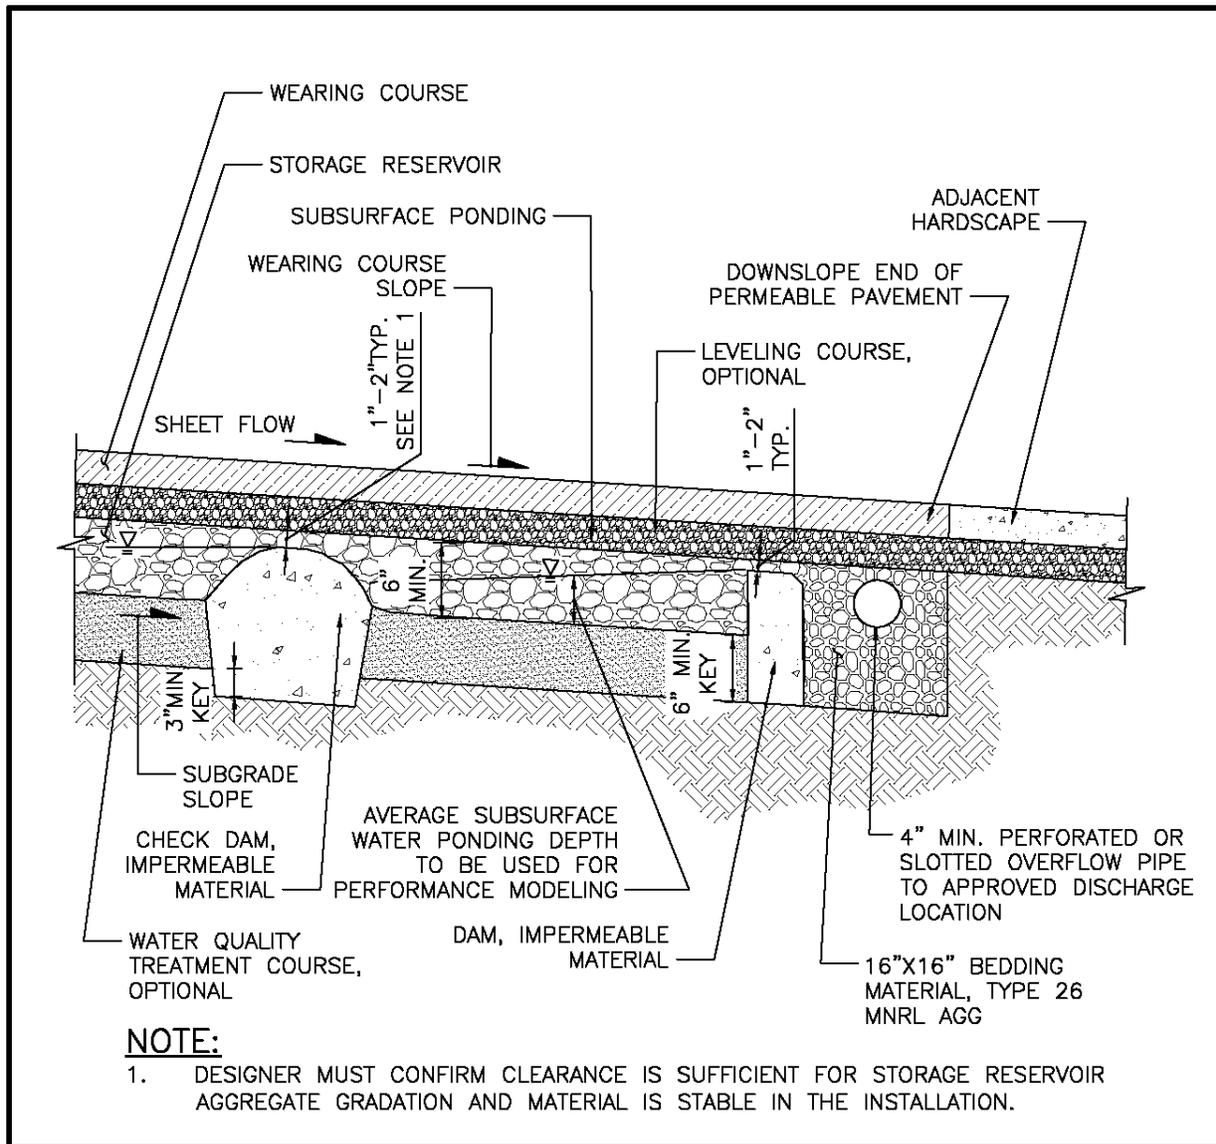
Typical Permeable Pavement Facility with Checkdams.
